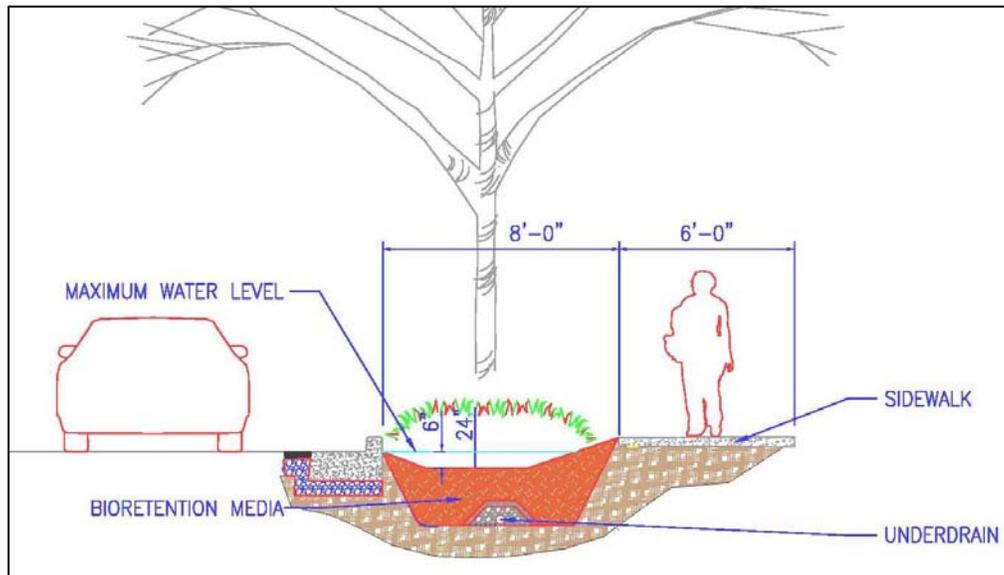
Proposed cross-section for Decatur Street curb-side bioretention cells.
